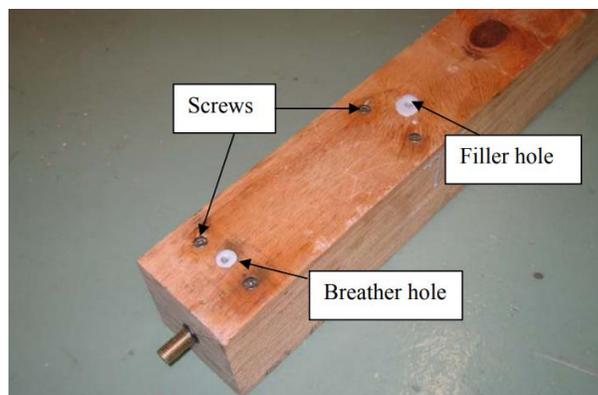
Test specimen cast using West System, showing screws, filler and breather holes [107].
